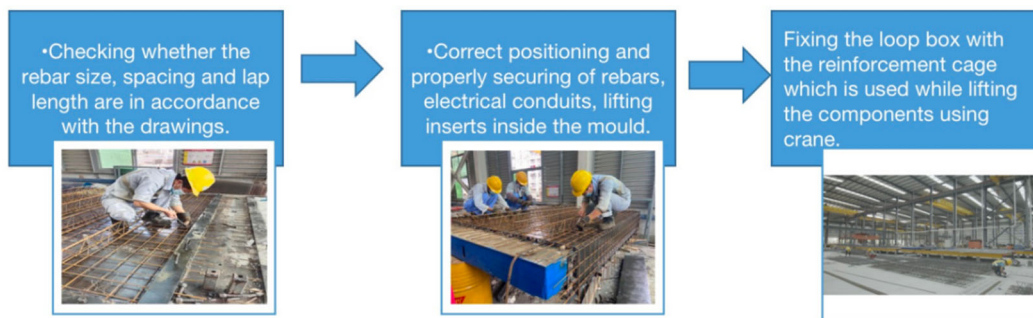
Fixing of rebars of a prefabricated RC slab.
